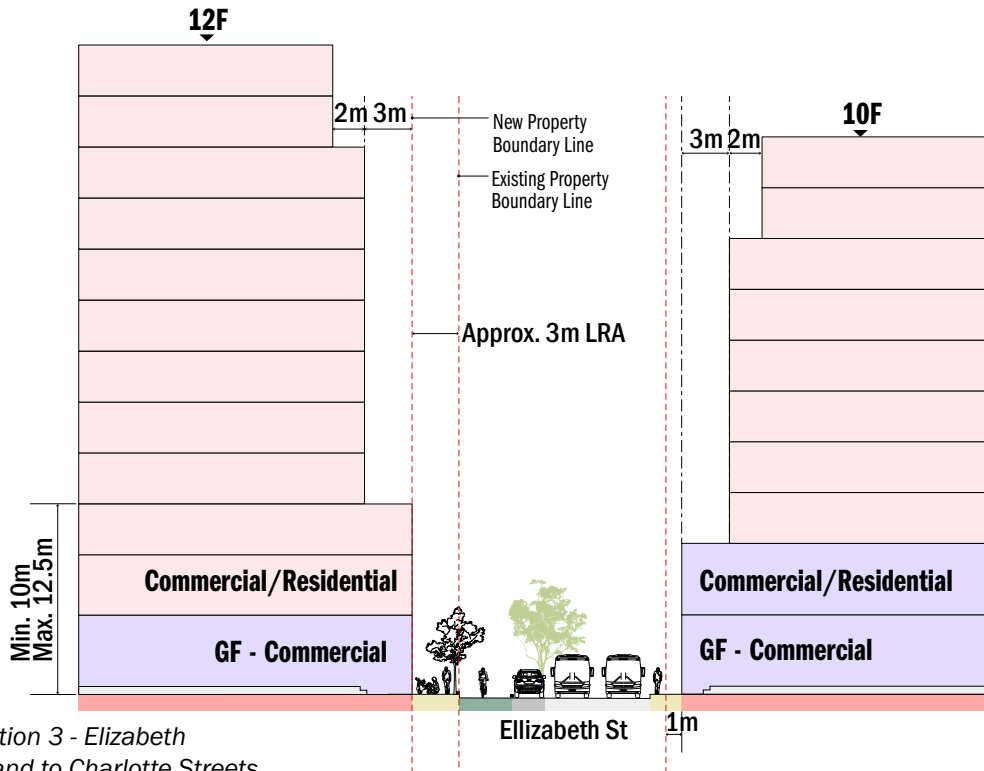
Section 3 - Elizabeth Street from Bland to Charlotte Streets including LRA
